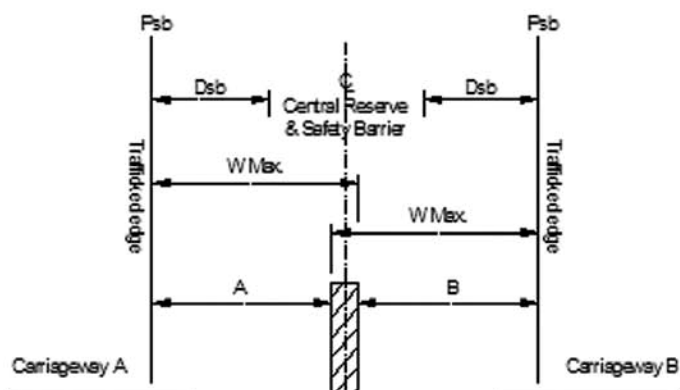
(c). Maximum Working Width Class Achievable with Safety Barrier Located Centrally in Central Reserve.
